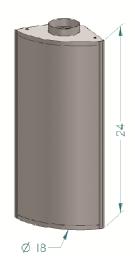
Displacement diffuser used in the room. Dimensions in inches.
